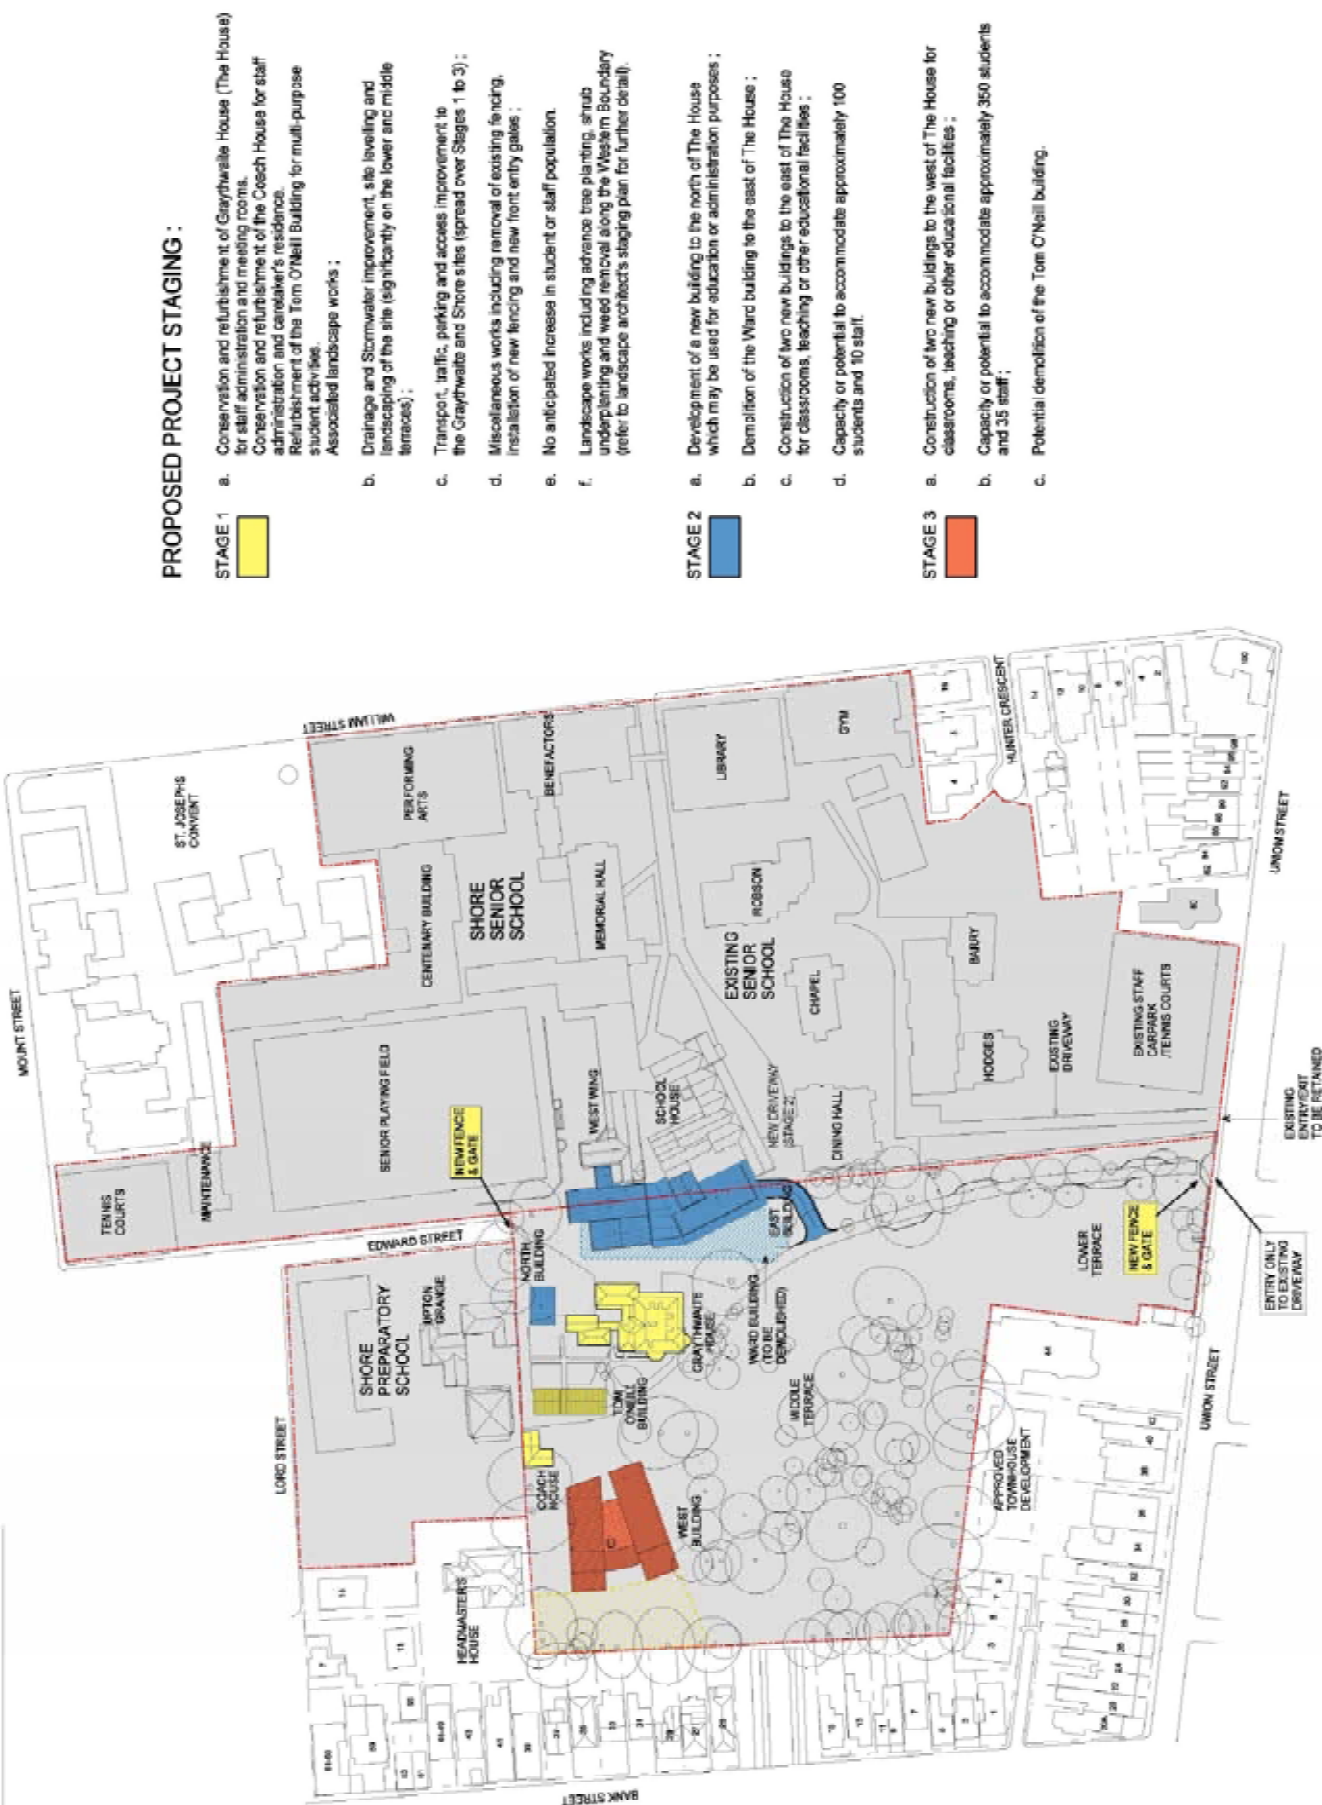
Concept Plan staging diagram (Source: Mayoh Architects)
